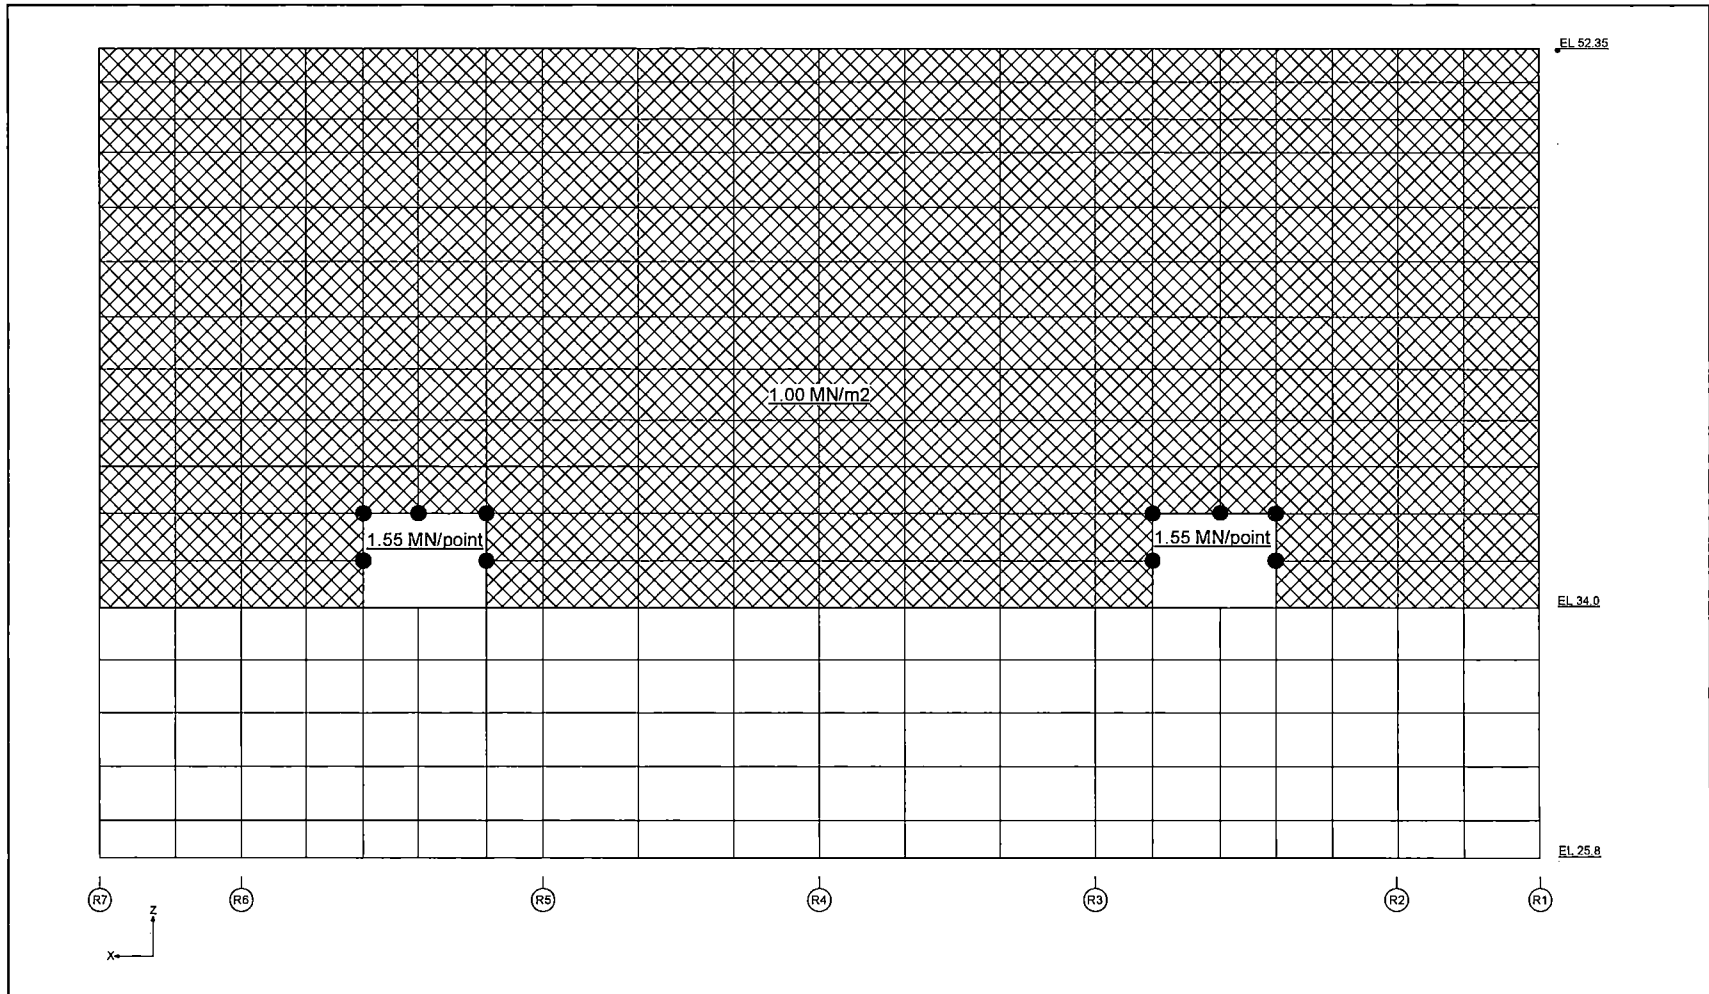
HELB Pressure Load (for RB General Rooms: RB Wall)
